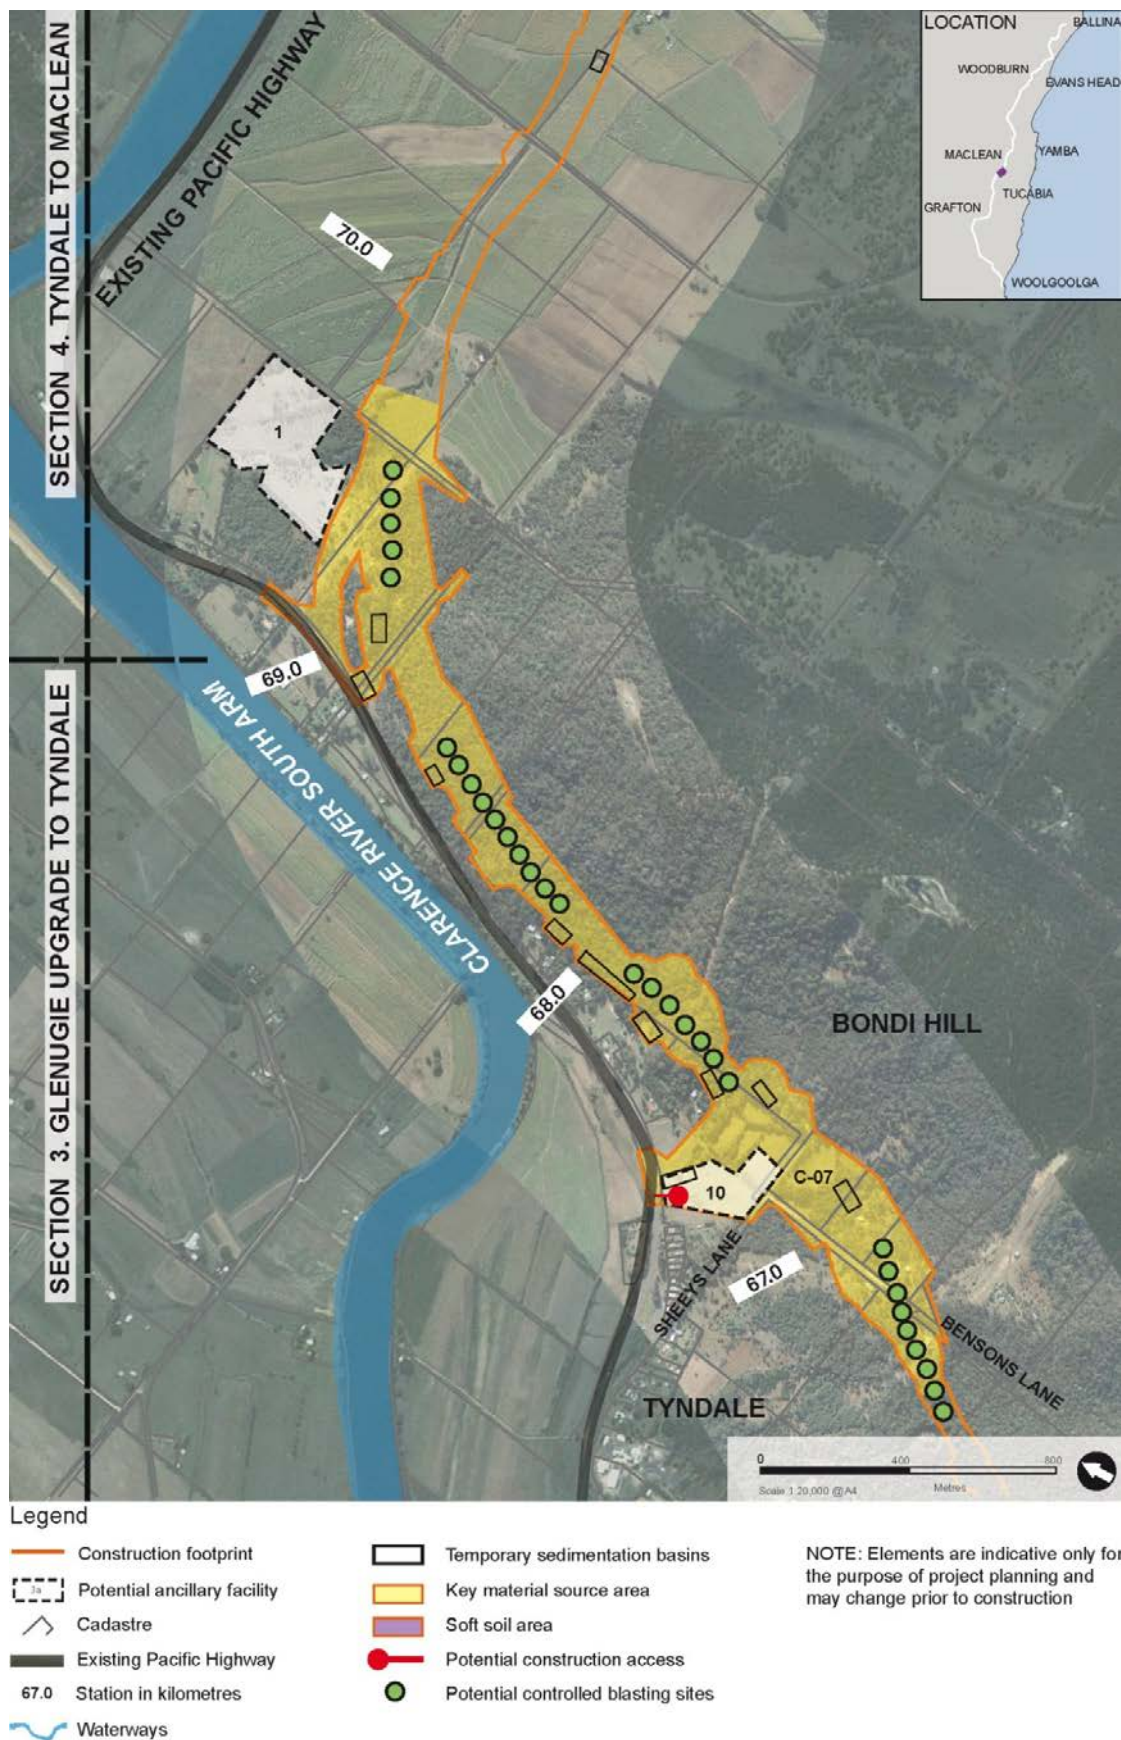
Extent of construction and construction features Section 3 (Station 66.5 to 70.8)
